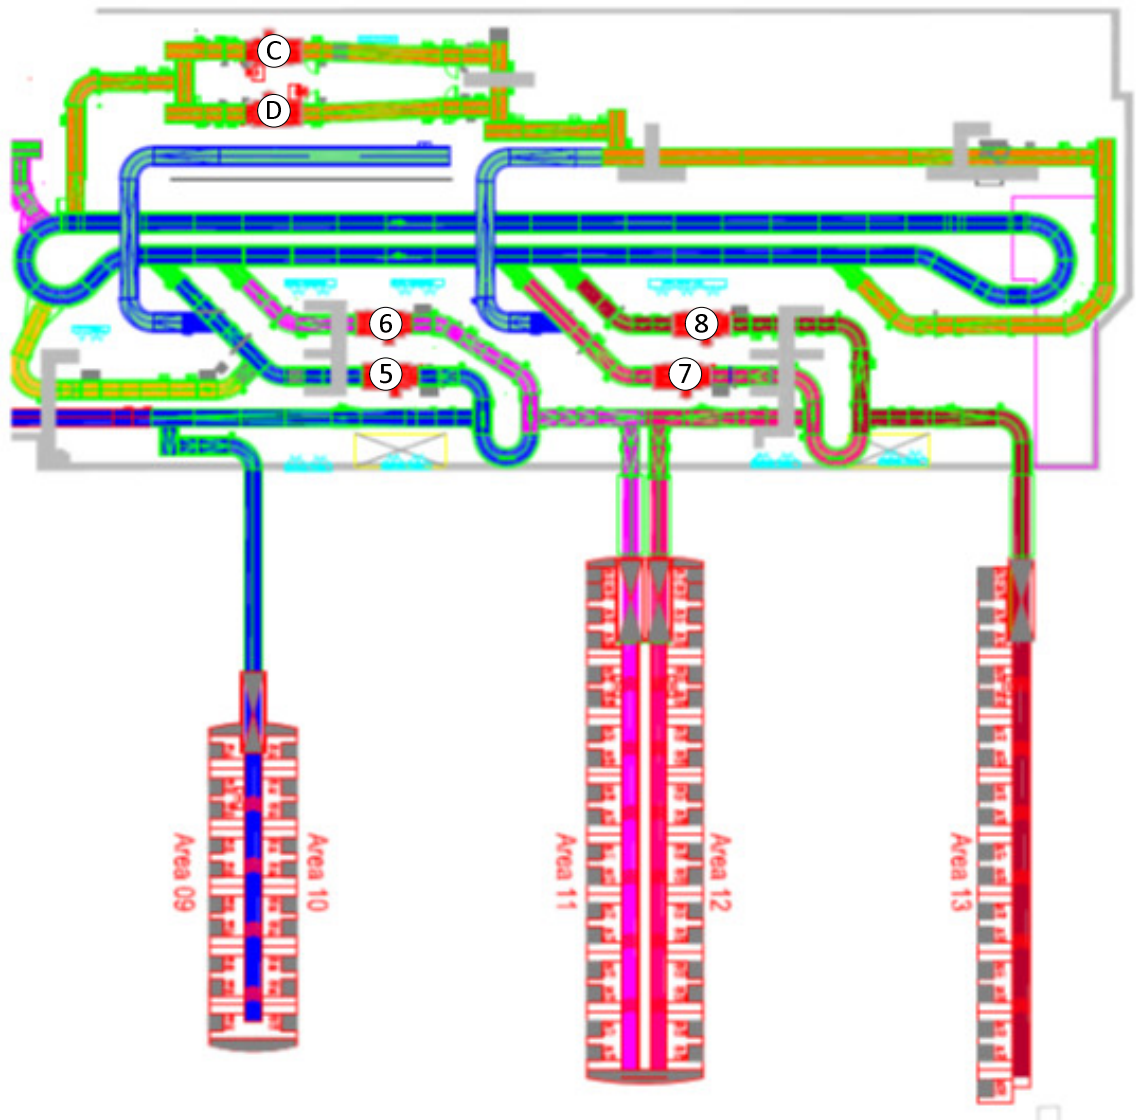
Illustration of northern section of the Terminal 1 baggage handling installation
